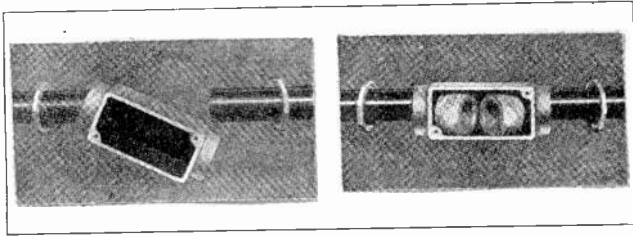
This view shows the convenient manner in which threadless fittings can be installed with conduit.
